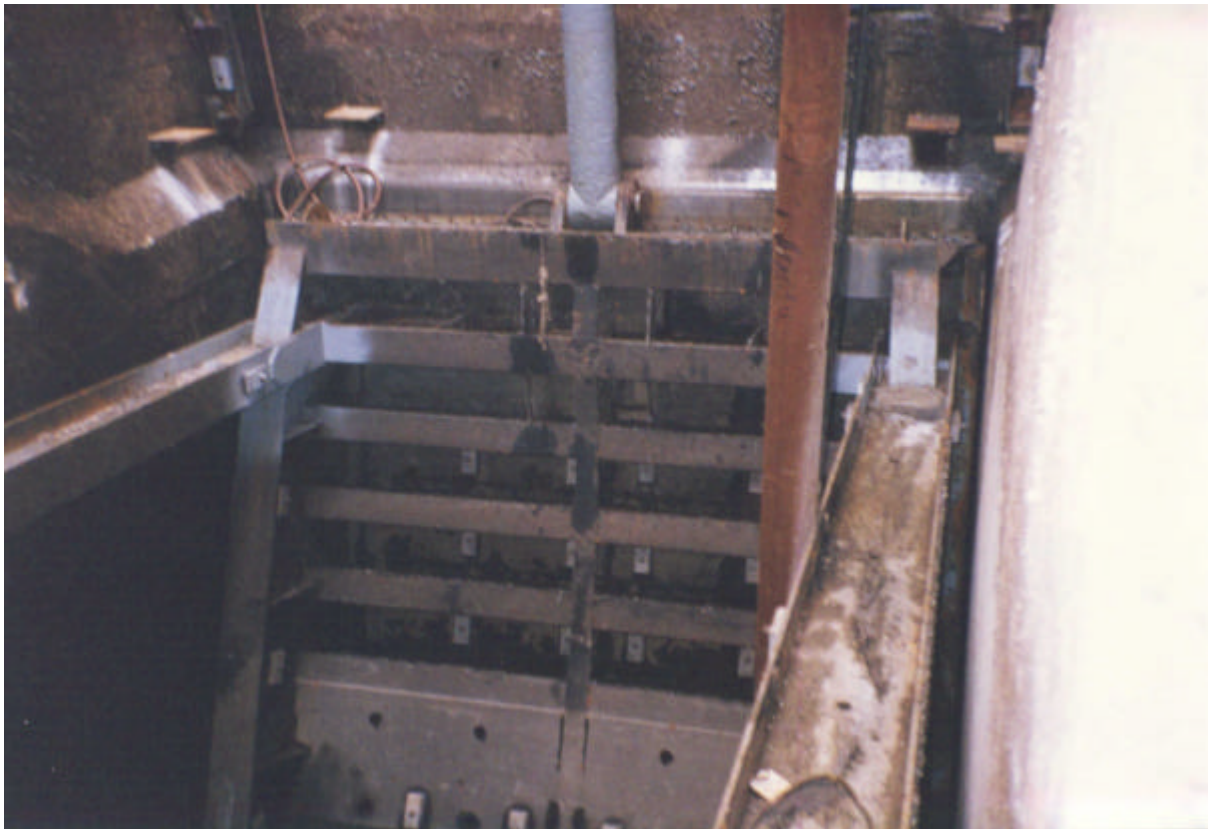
C. Markland Culvert Valve in the Pit
